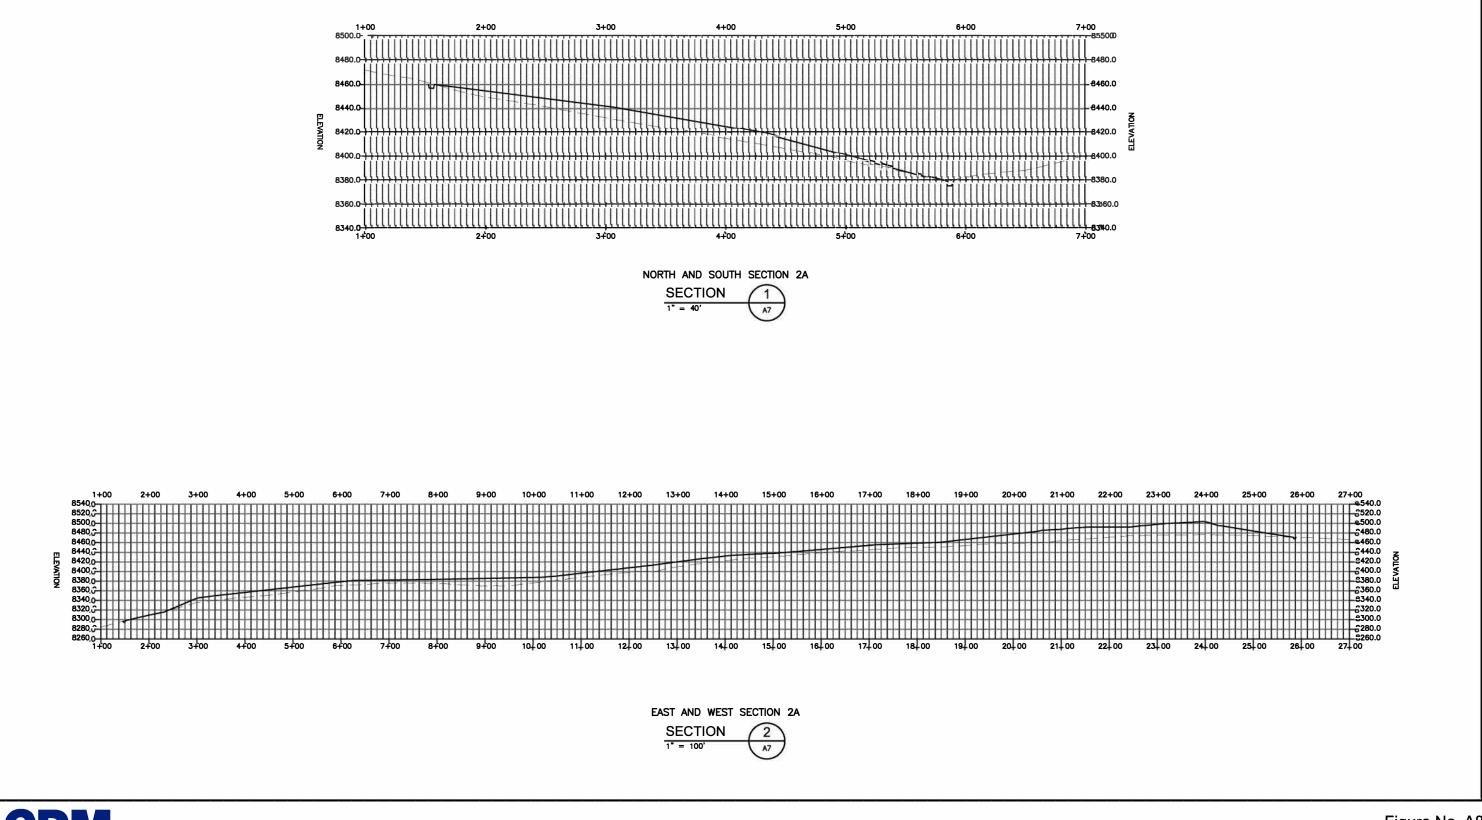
WORK AREA SITE PLAN - 2A AUGUST 2018
